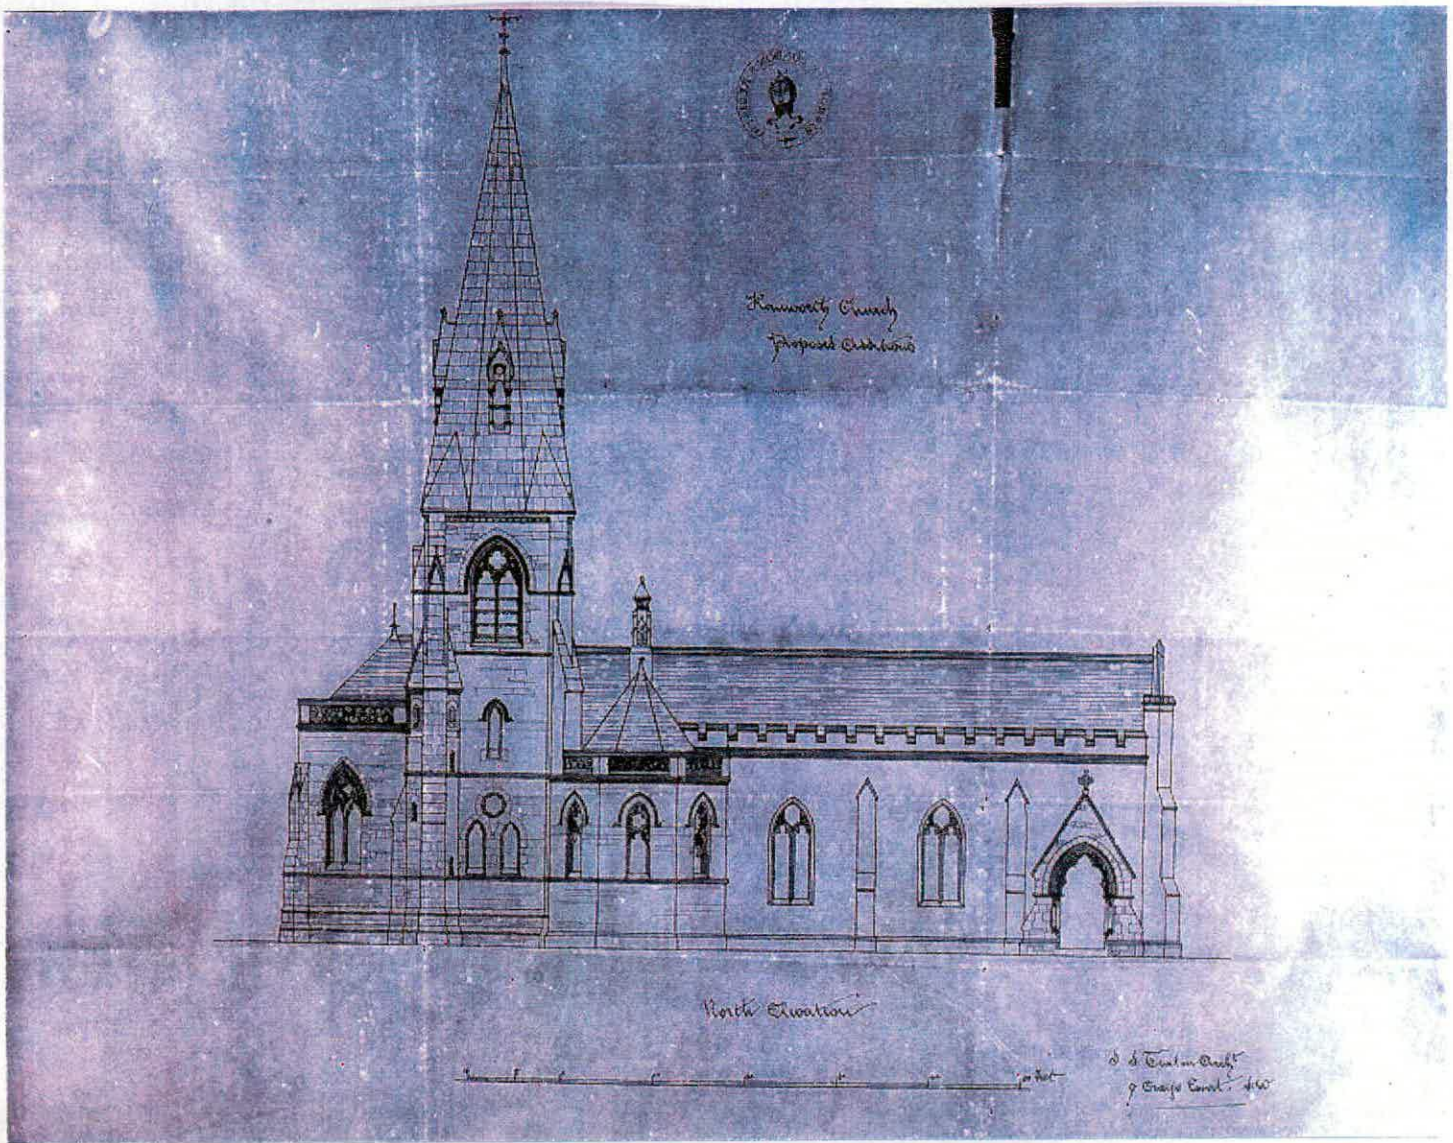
, 'Proposed Additions' to the north elevation of Hanworth Church by SS Teulon, c. 1865 (Guildhall Collection)
